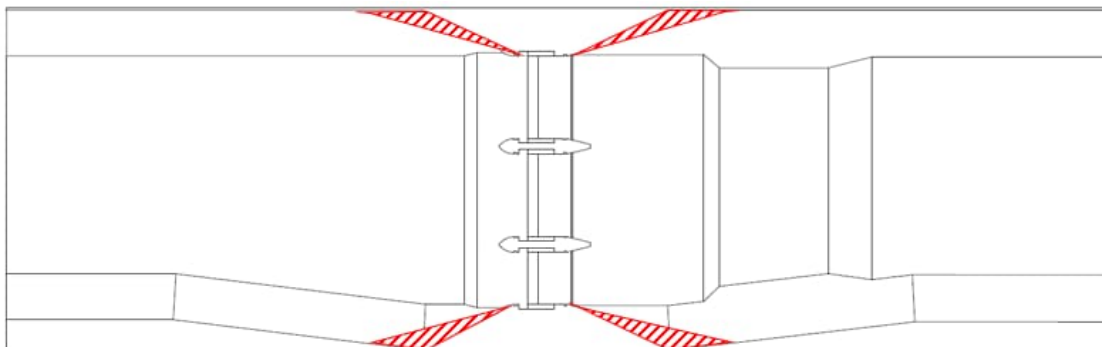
Streamlining the wing walls at the abutments, slope angle 4 to 1 instead of 2 to 1.
